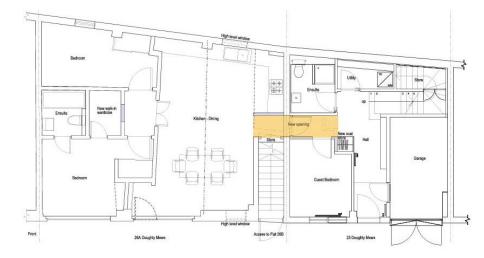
Proposed Ground Floor – No 26a & No. 25
